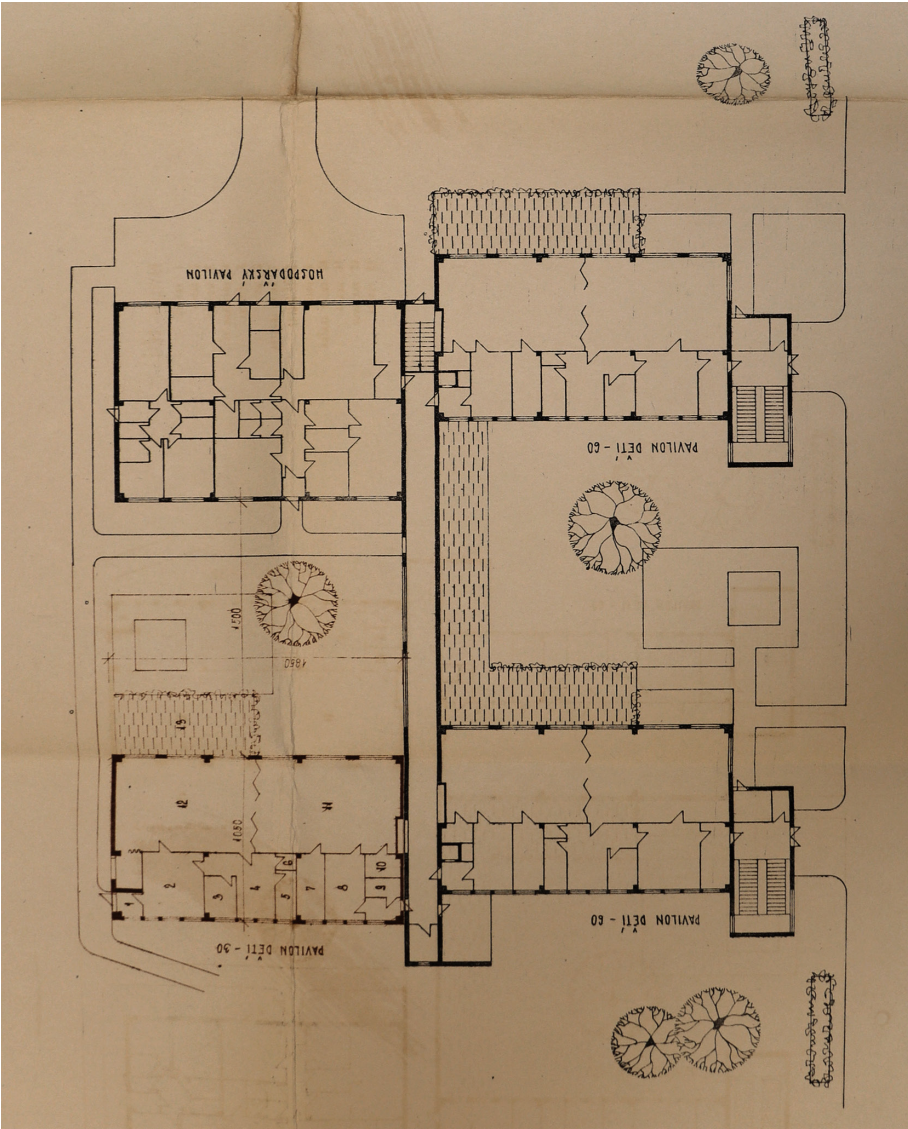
| Existing kindergarten project (*Kindergarten Floor Plan, 1974*)
